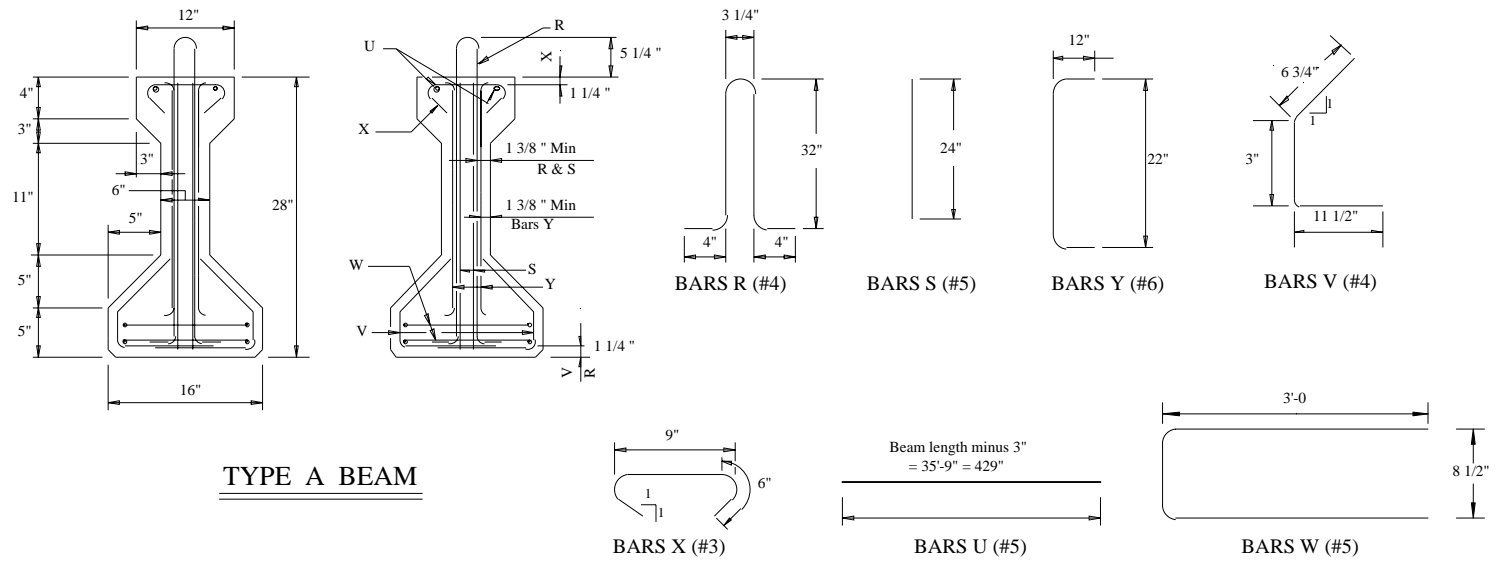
Longitudinal Reinforcement Detail of the Traditional Specimen
